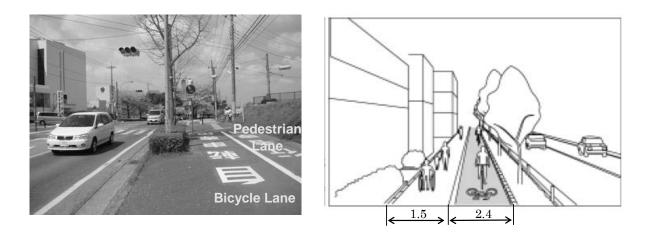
Typical Cross Section (Separated Bikeway on Sidewalk)
